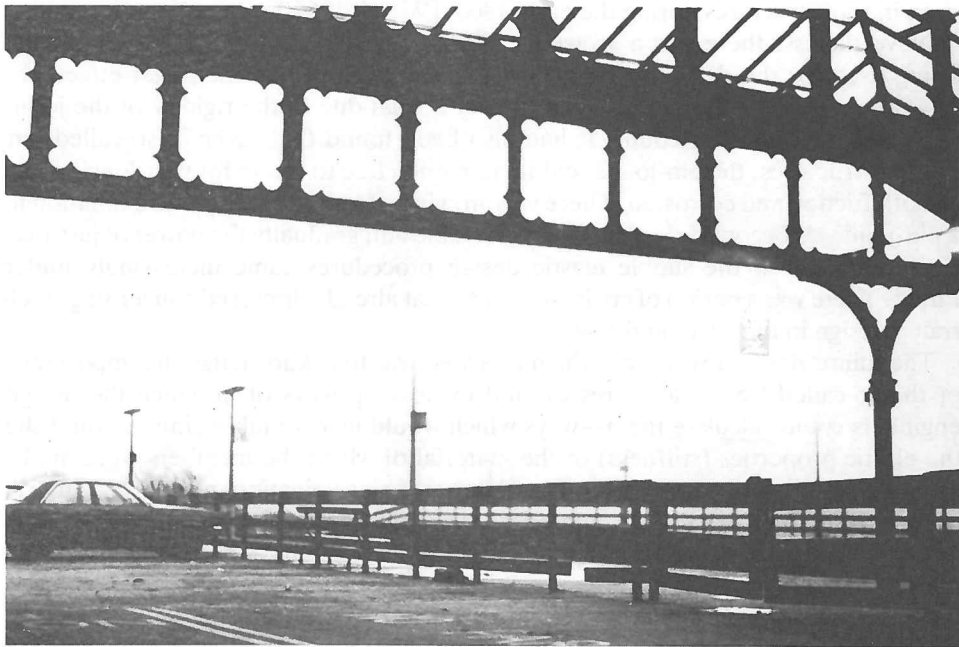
The cast-iron 'Vierendeel truss' in the roof of Durham railway station (1840s)
